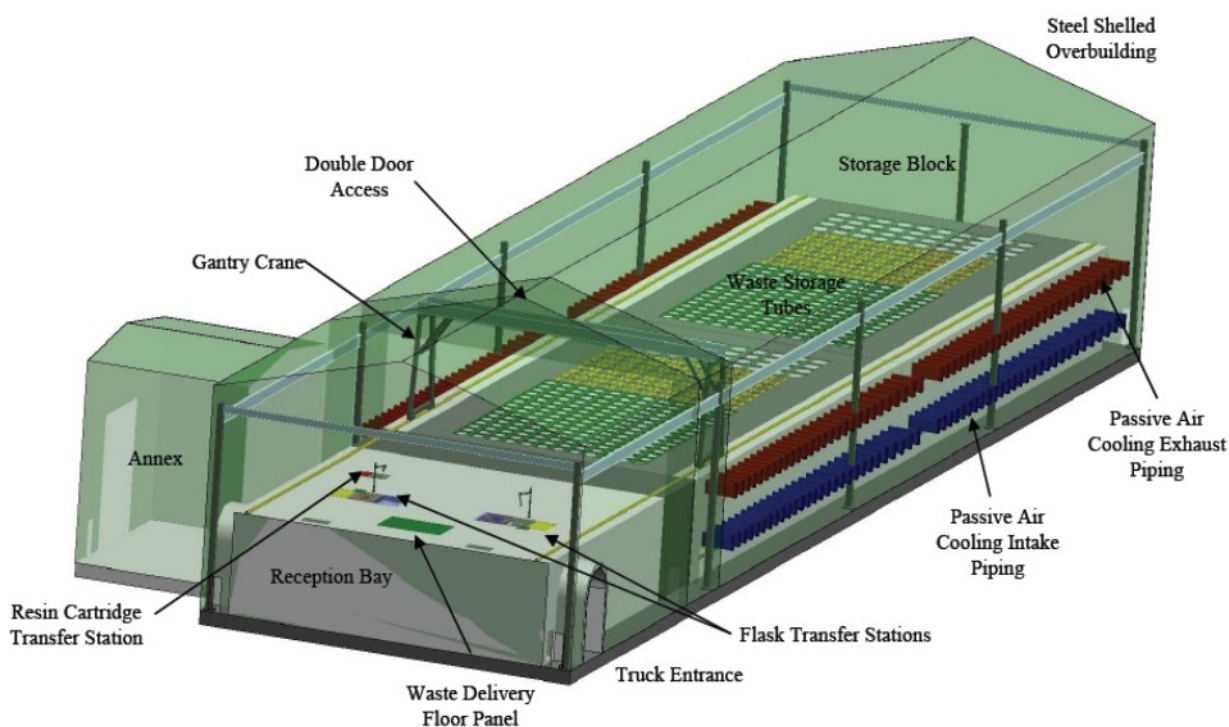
1: Layout for the Indoor waste transfer, Indoor storage conceptual design.
